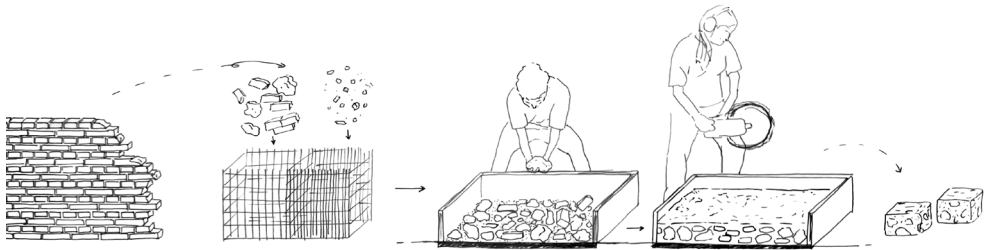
| Making process. The demolition waste can be used for rammed earth walls and blocks.
